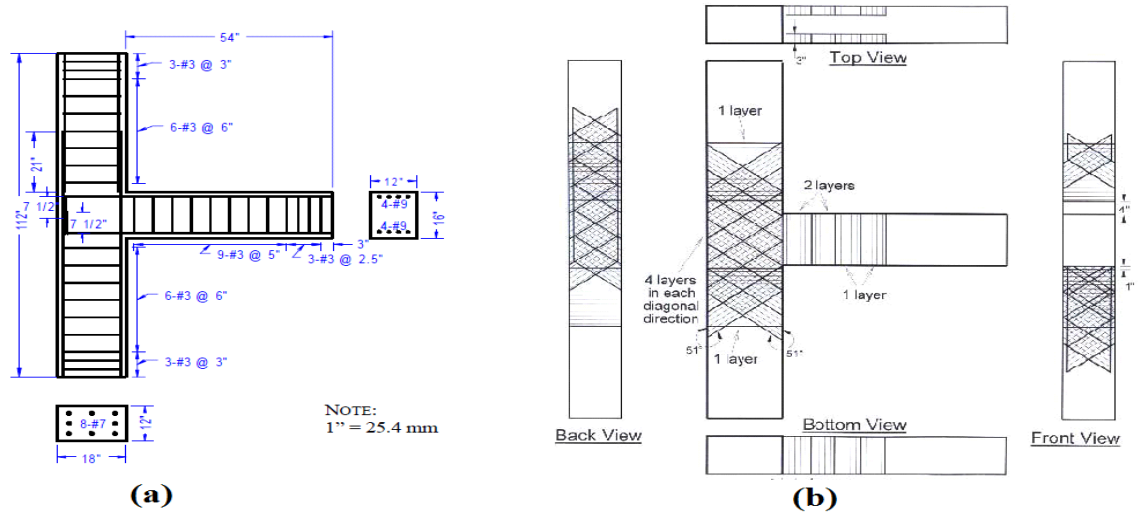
(a) Geometry of BCJ specimen and reinforcement detailing (b) Exterior BCJ retrofitted with FRP [21]
